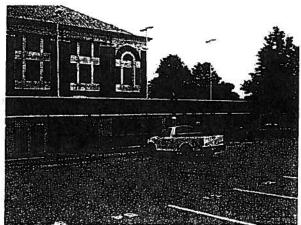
Elevated parking and city hall roof with roof drains to test area.
